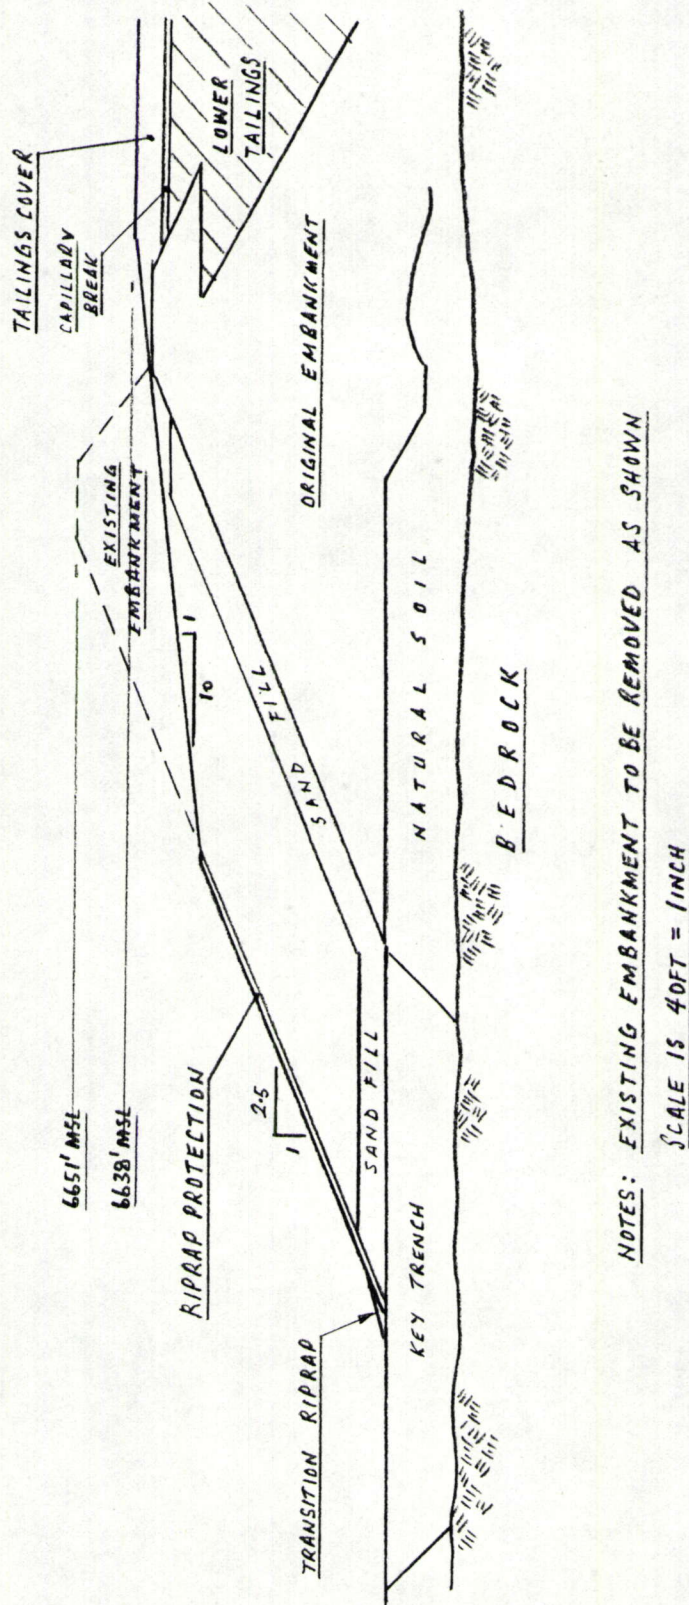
CROSS SECTION OF LOWER DAM AT RECLAMATION
